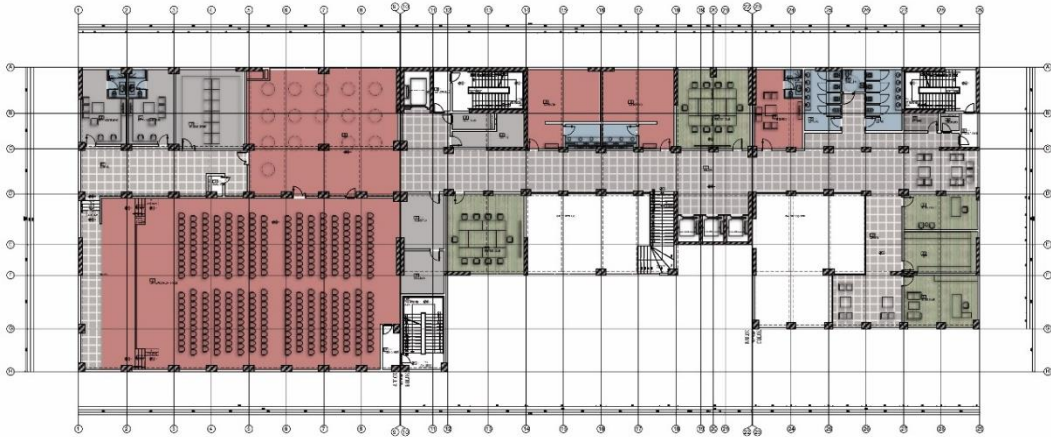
300-bed teacher's house first floor plan, Çelik, 2017
